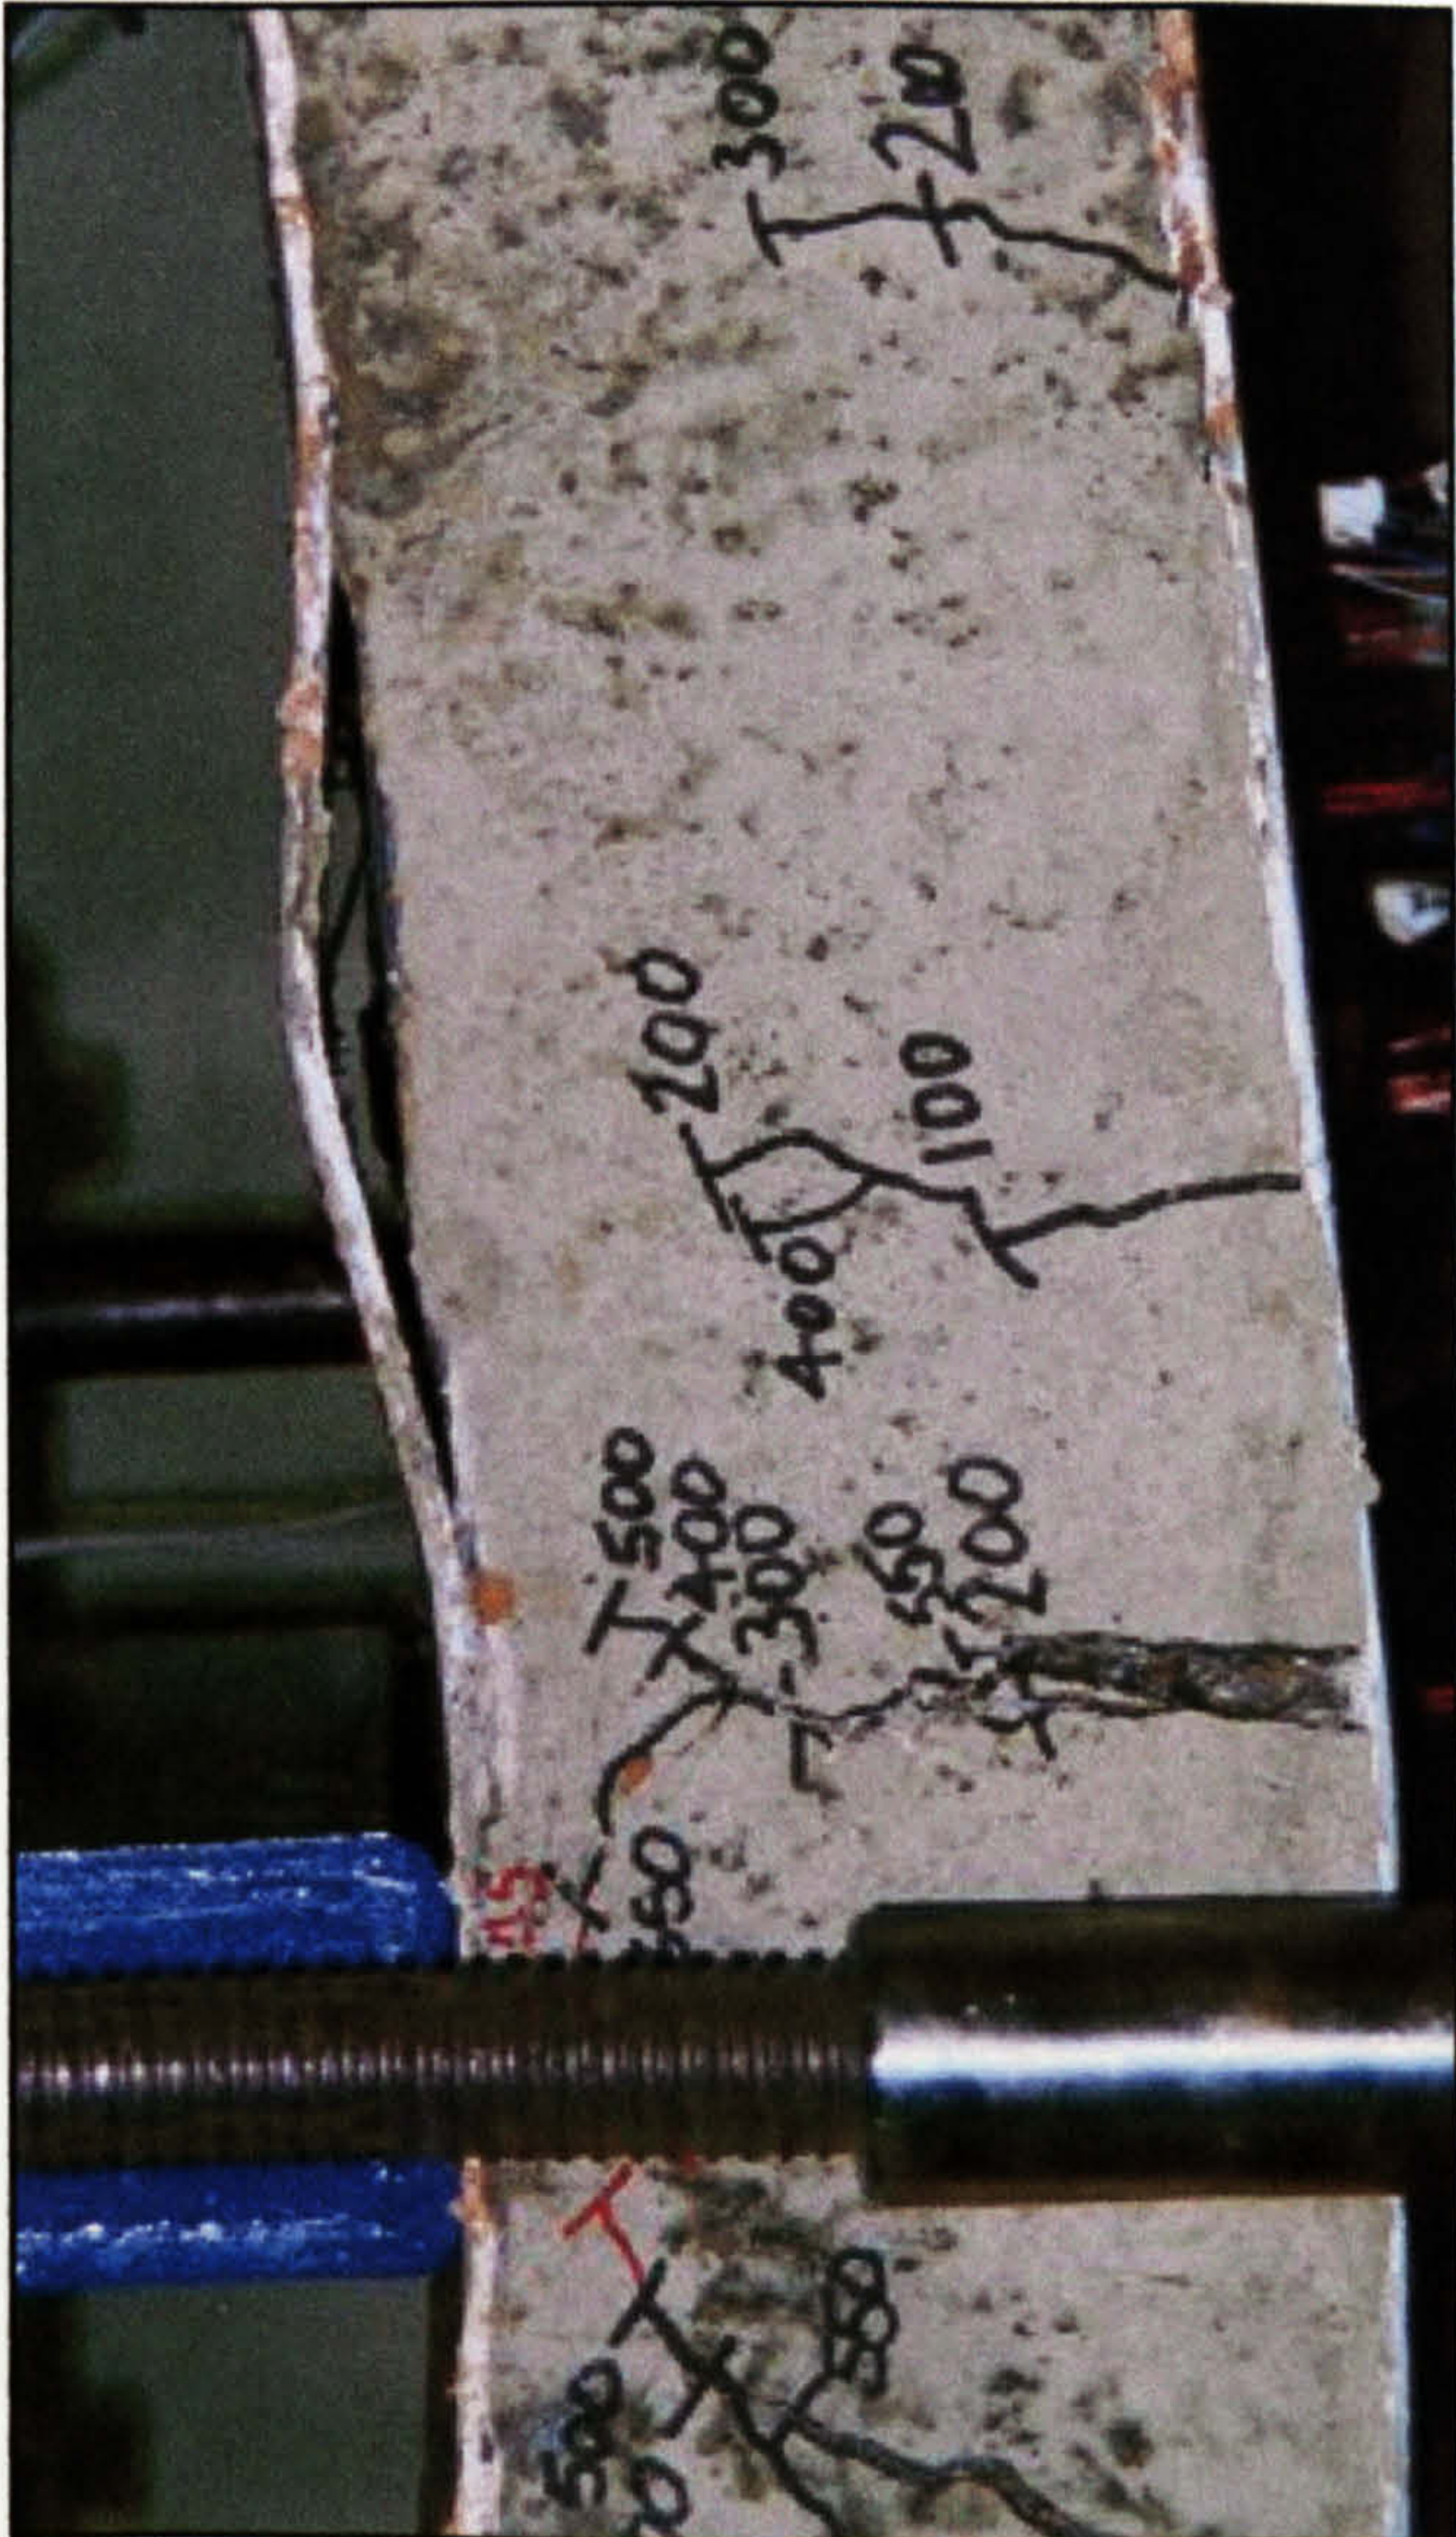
Close-up of failed area showing concrete cracks originating from connector locations.
